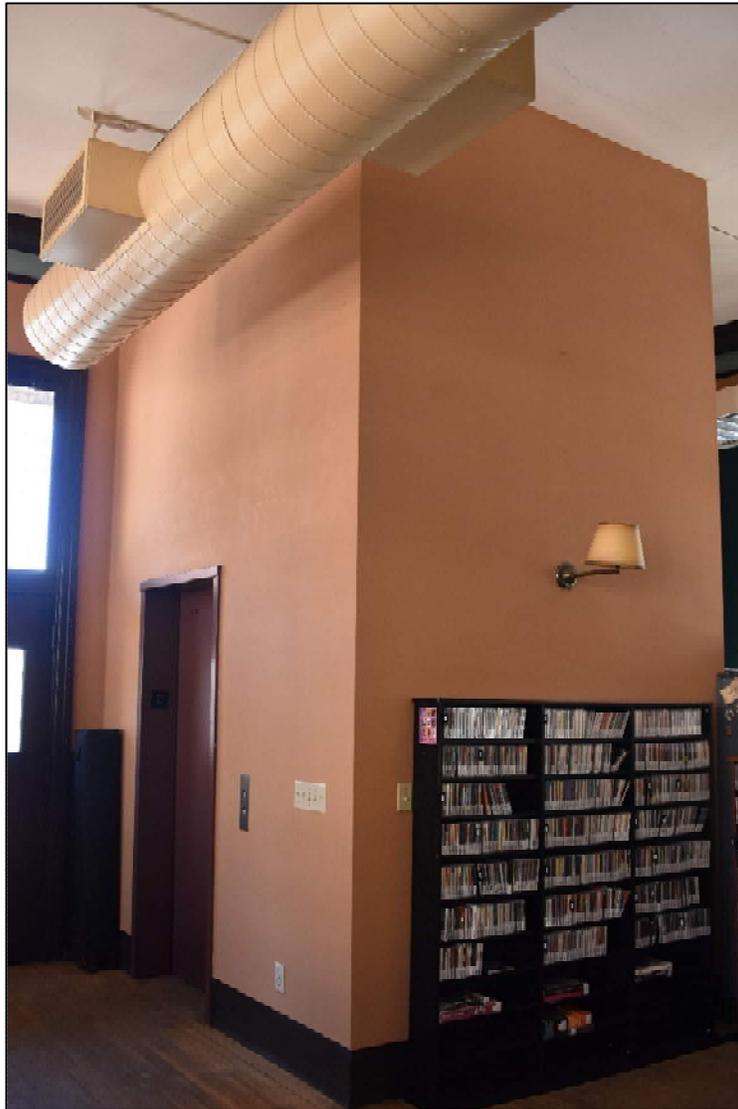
Modern elevator shaft and air duct, looking southeast. March 2021.
